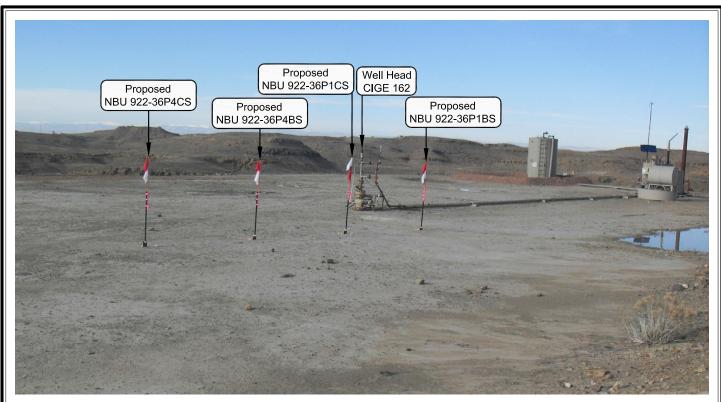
PHOTO VIEW: FROM PIT CORNER D TO LOCATION STAKE
